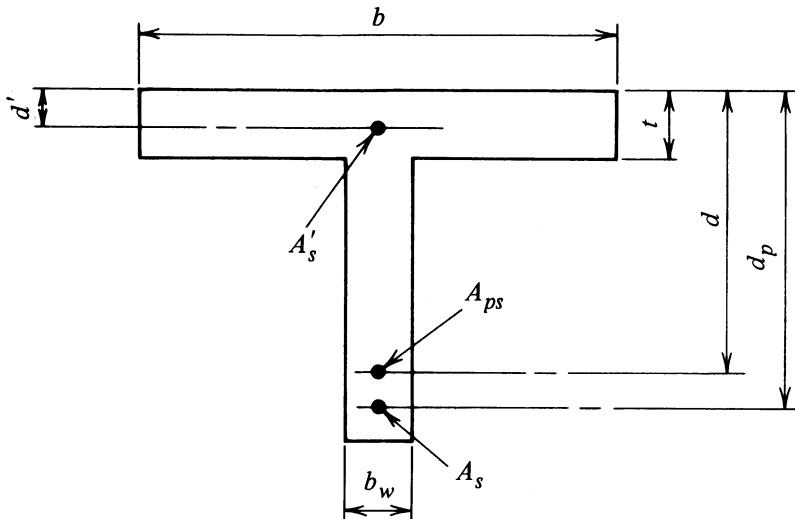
Cross section of a T-shaped flexural member having bonded nonprestressed tension and compression reinforcement in addition to bonded prestressed reinforcement.
